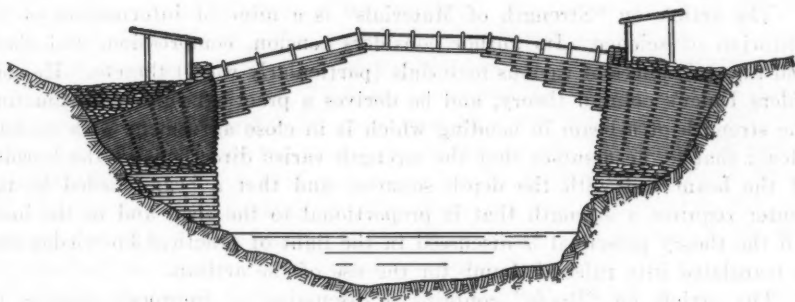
CANTILEVER BRIDGE IN THE KINGDOM OF MULI.
